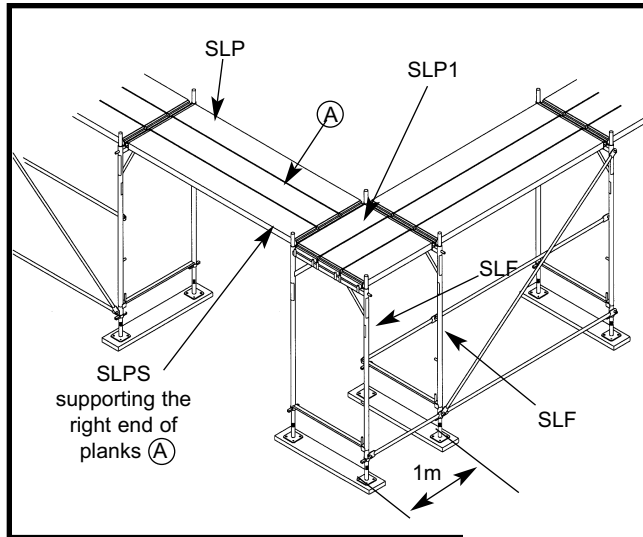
Alternate Corner Arrangement (Inside or Outside)
